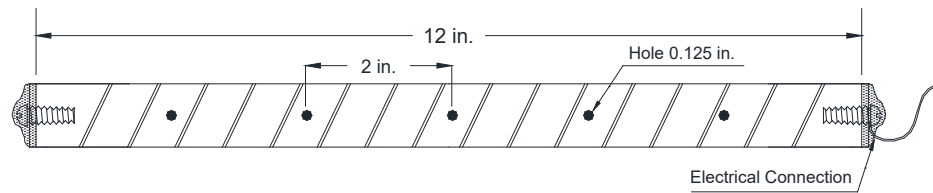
Damage pattern of epoxy-coated bar (plan view) in bench-scale tests
